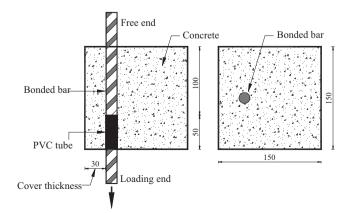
Geometry and dimension of pull-out test specimens (unit: mm).
